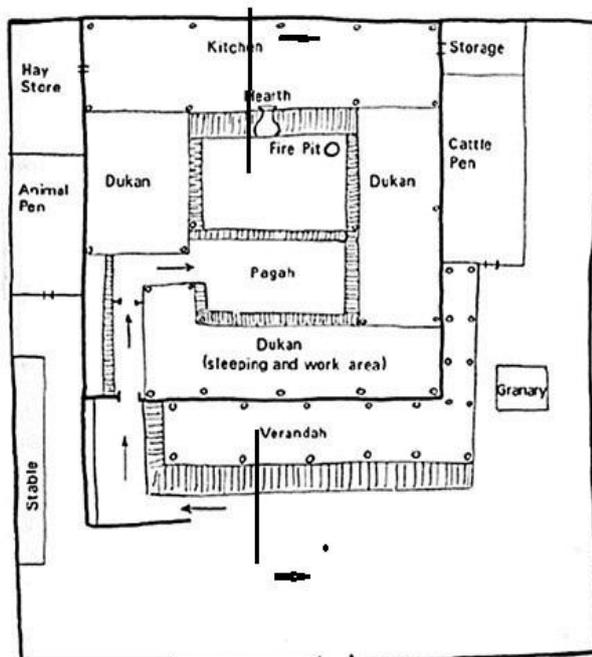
Typical schematic arrangement of the Wakhi House's introverted plan and section in Khandud is placed around a middle space (Pagah) with four platforms (Miller, 2007) Section drawn by authors.
